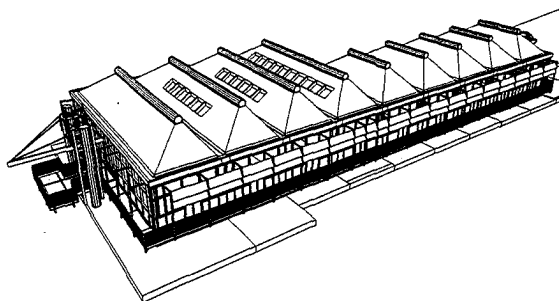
CBPD-IW: Detail view of enclosure showing roof configurations and innovation external shading/light redirecting devices
